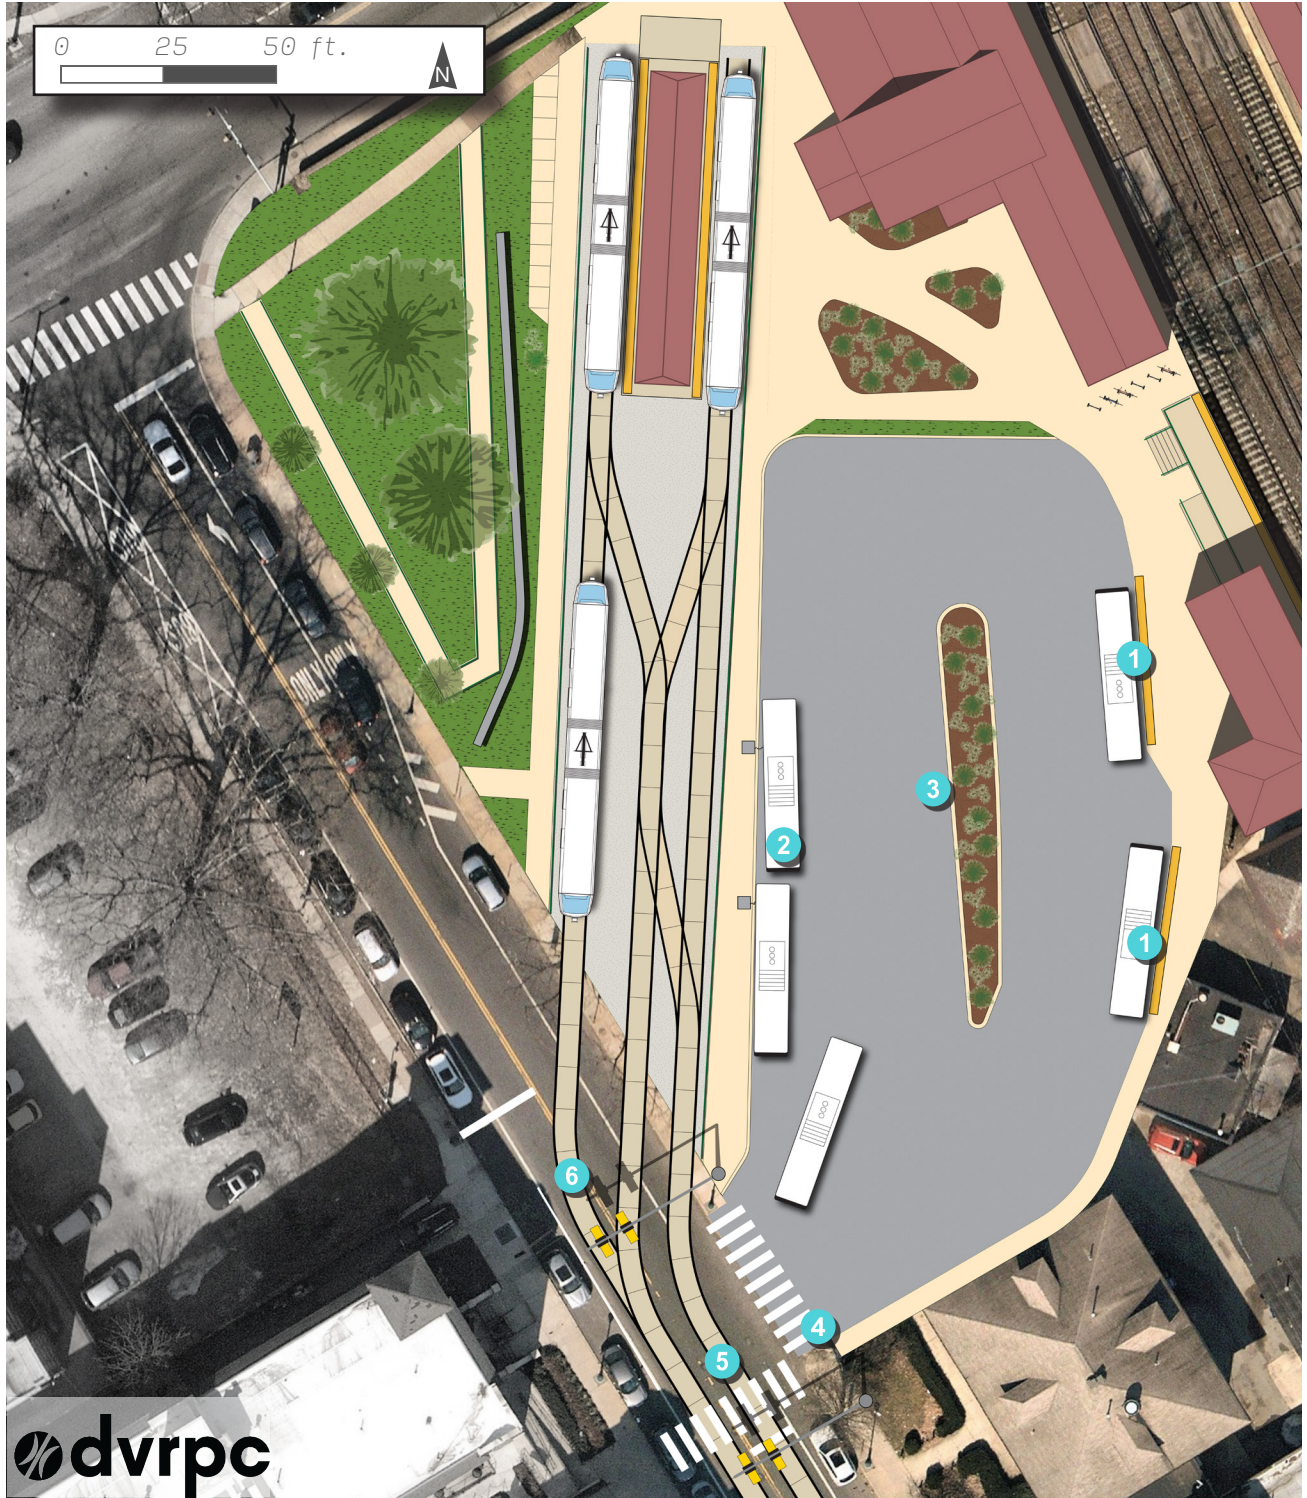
Site plan detail: Bus Terminal. (DVRPC and Nearmap, 2021)
